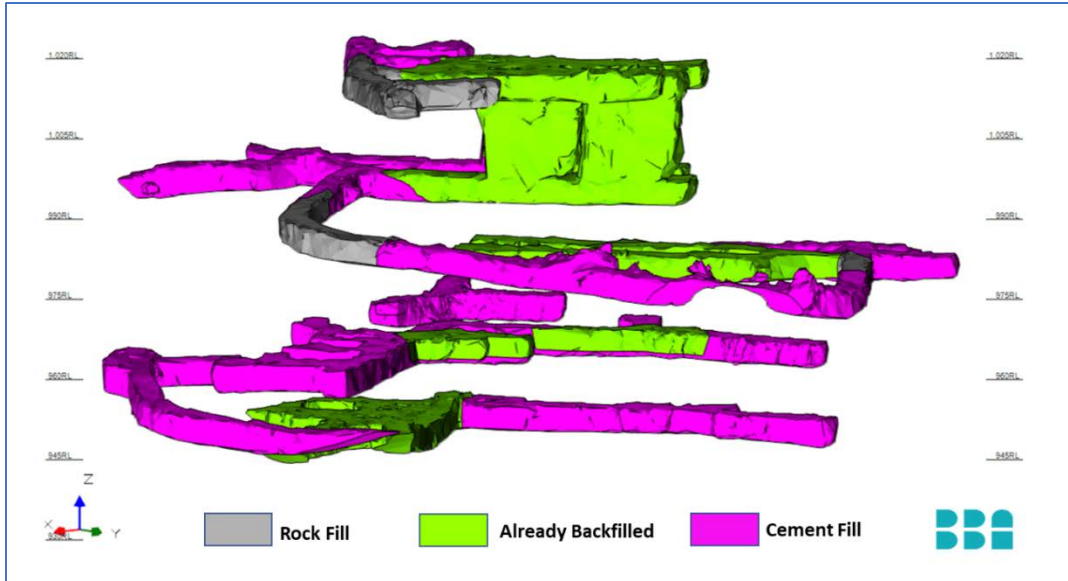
Underground Openings in Pit Wall (figure not to scale)
